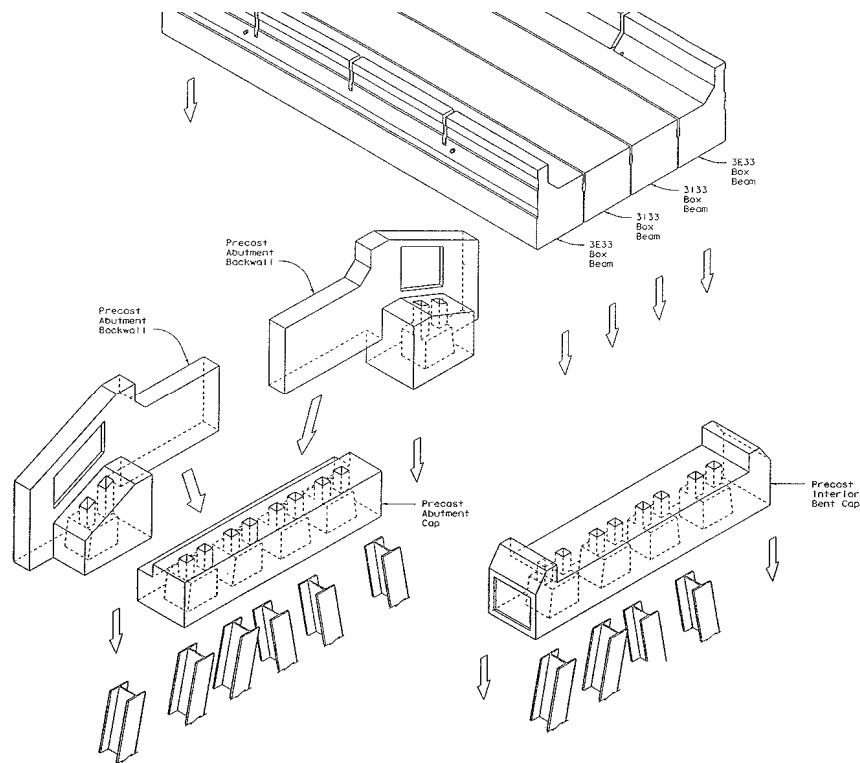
Texas State Railroad Bridge Precast Bent Cap System
